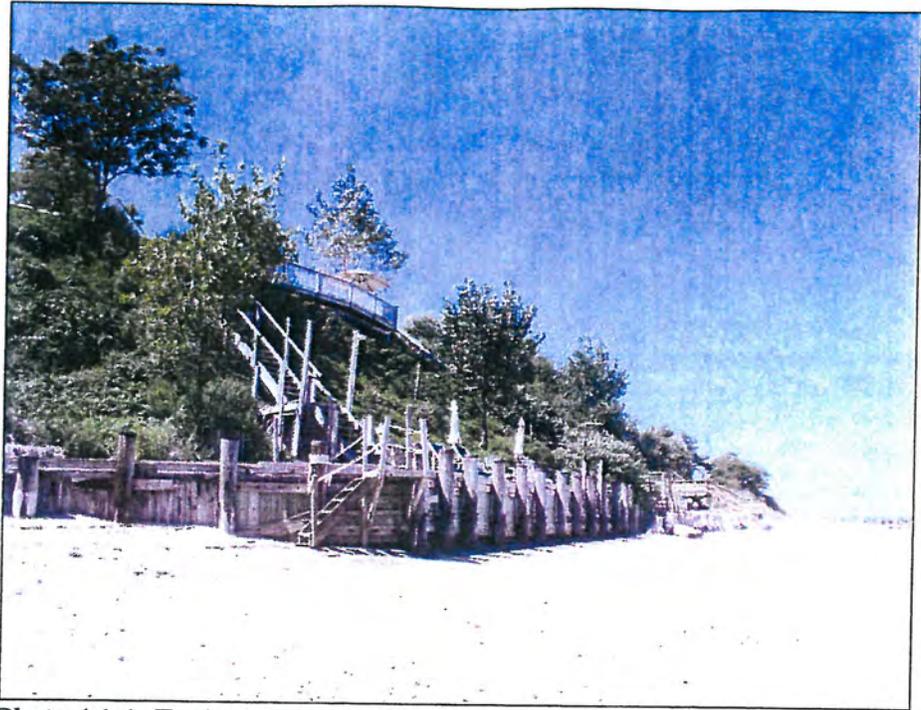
Typical timber bulkhead protected shoreline.
